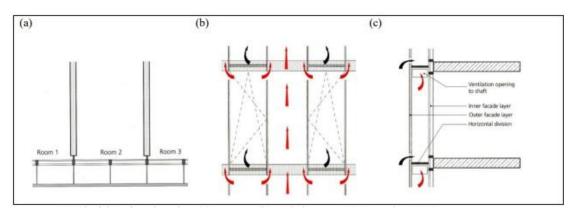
Shaft Box Type: (a) plan, (b) section, (c) elevation (Azarbayjani, 2010)
